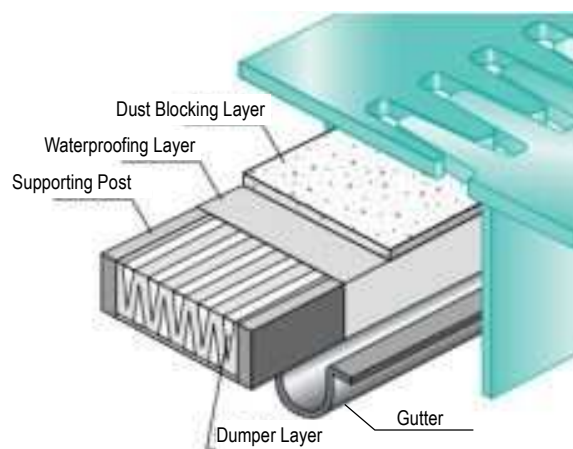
Example of Expansion Joint with waterproofing Structure
